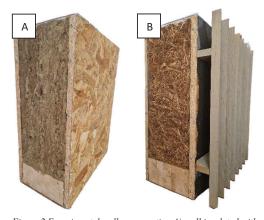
Experimental wall cross section A) wall insulated with MW B) wall insulated with experimental Oak tree bark (from outside to inside: veneer plywood 1.4cm, steam dam 0.017cm, MW or tree oak bark 20cm, vapour-permeable film 0.038cm, OSB panel 2.4cm
